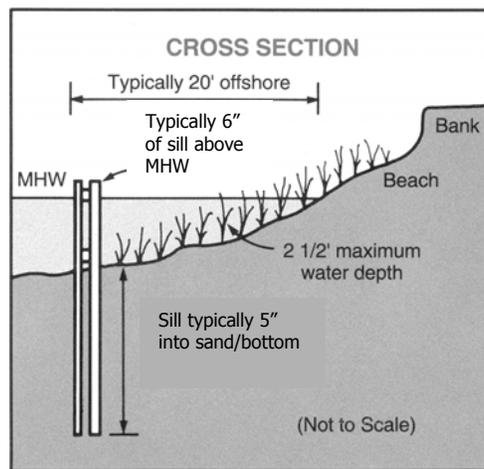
Cross-section of a timber sheet pile sill. (Rogers et al. 1992)
